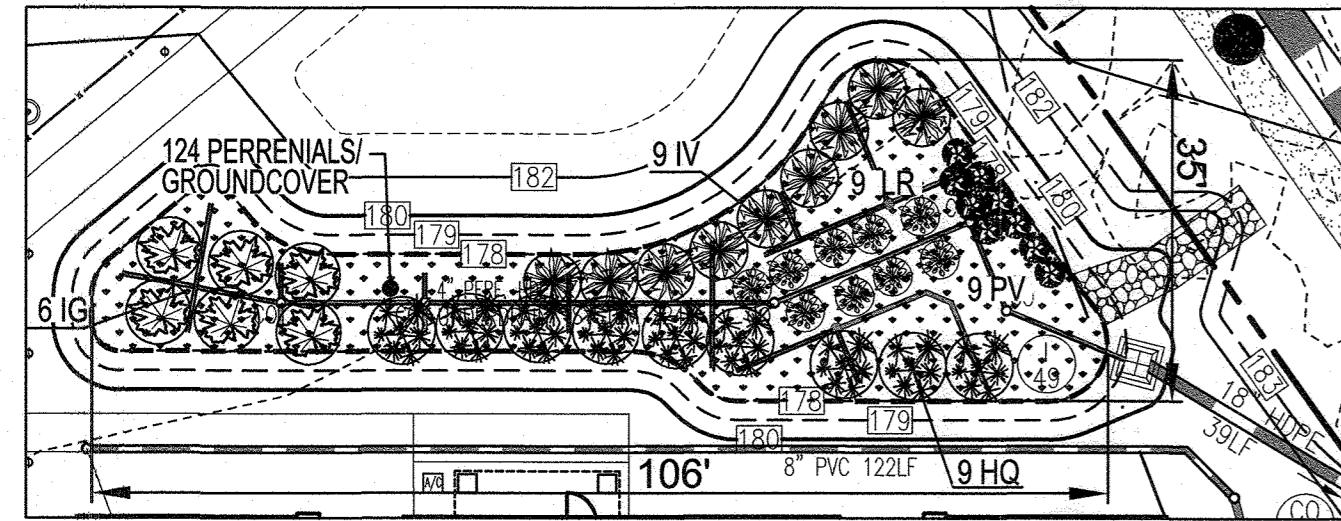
DETAILED BIO AND PLANTING PLAN (SWM #17)
